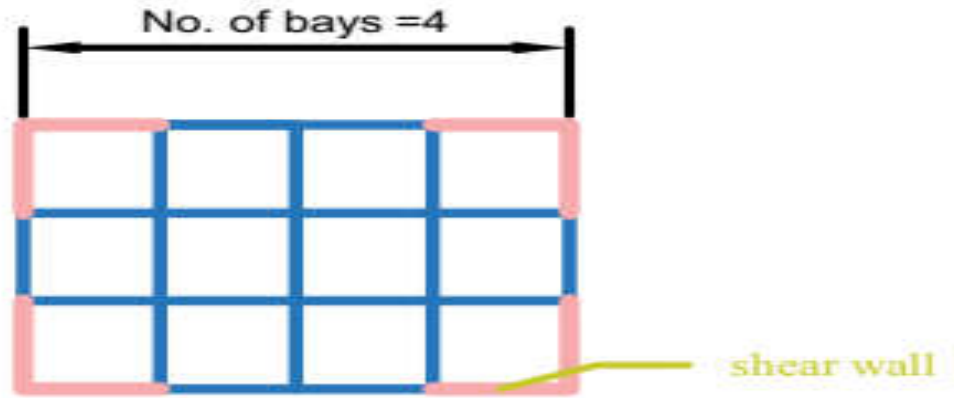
Plan of the Building (Shows the Location of the Shear Walls) Case 2.
